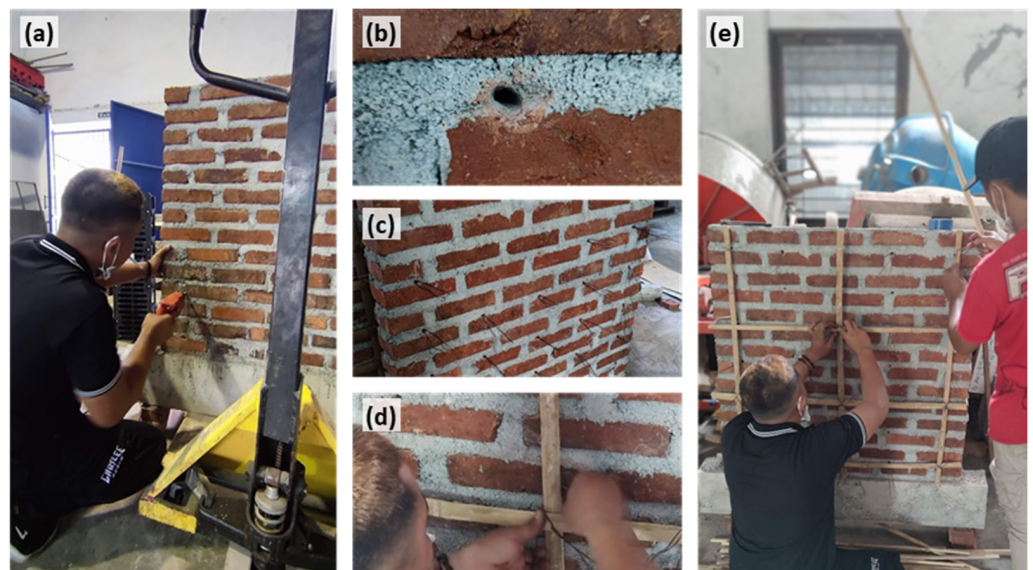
Preparation of the masonry panel with bamboo retrofitting: (a,b) boring holes on the mortar joint with specified distance, (c) placement of transversal wires into the holes, (d,e) placement of the bamboo strips on two sides of the wall and fastening using the prepared transversal wires.
